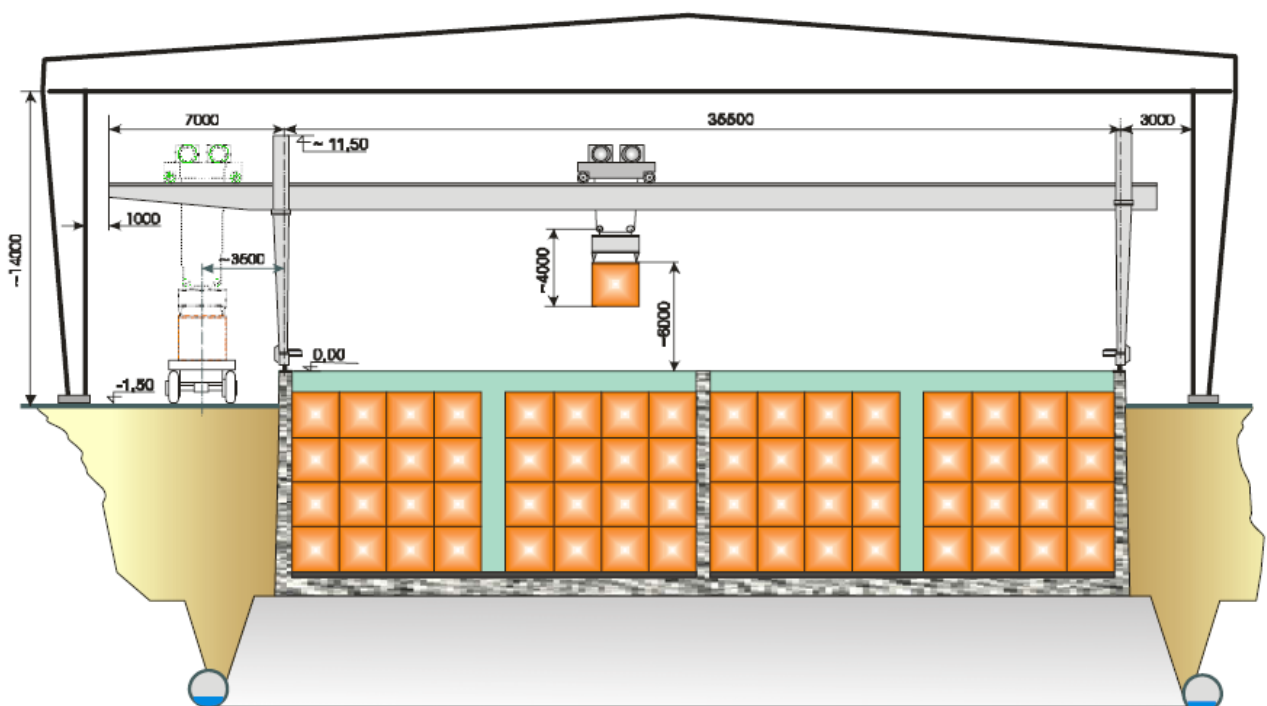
Cross section of a disposal module with a gantry crane and a protective hall
